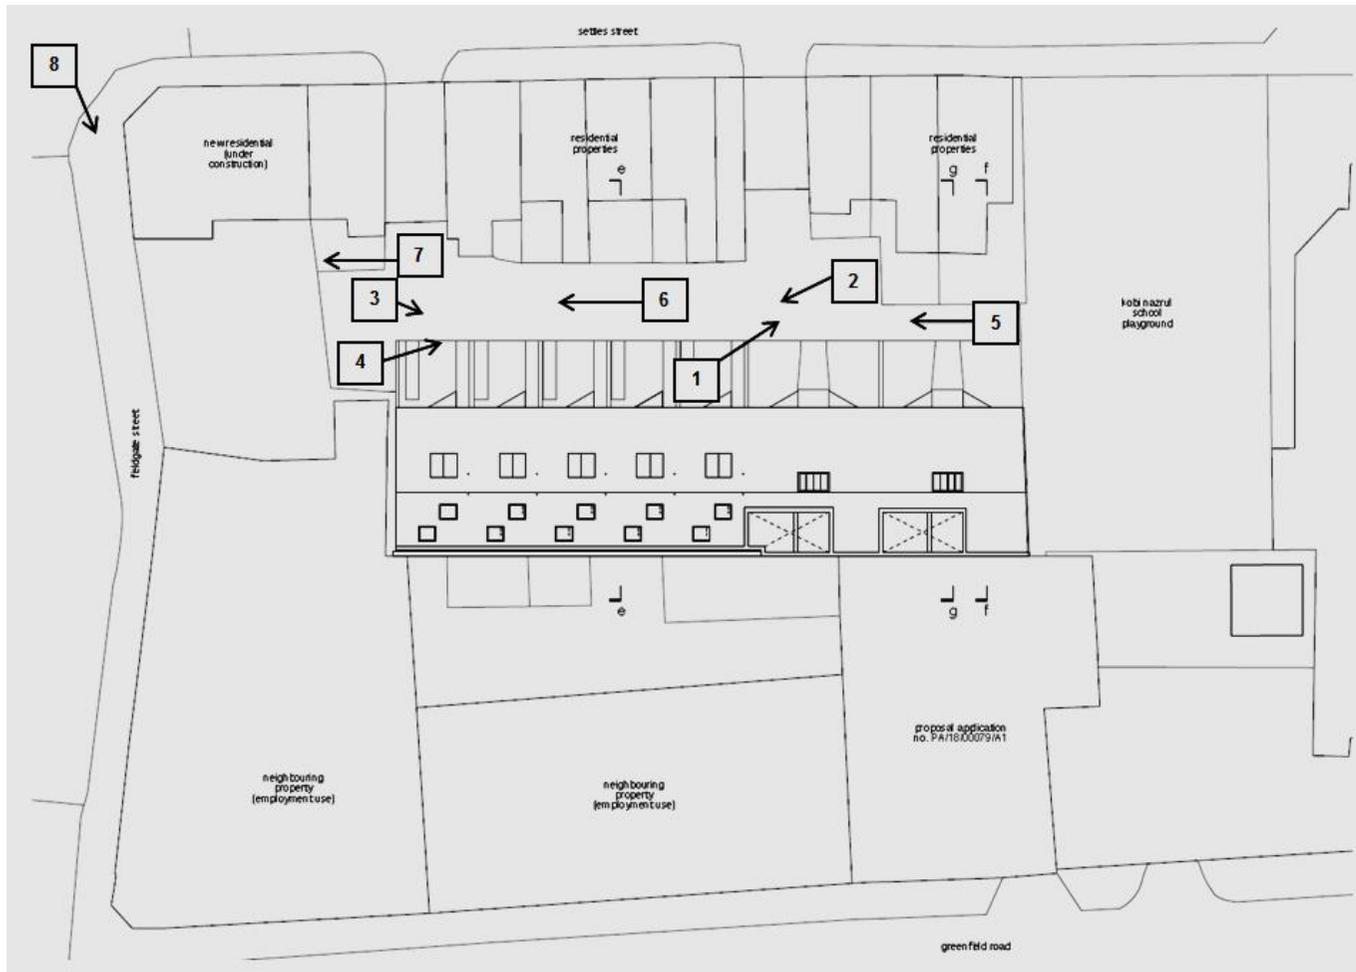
Block Plan to neighbouring development including showing relation to 3rd Storey floor plan to No 42 Fieldgate Street
